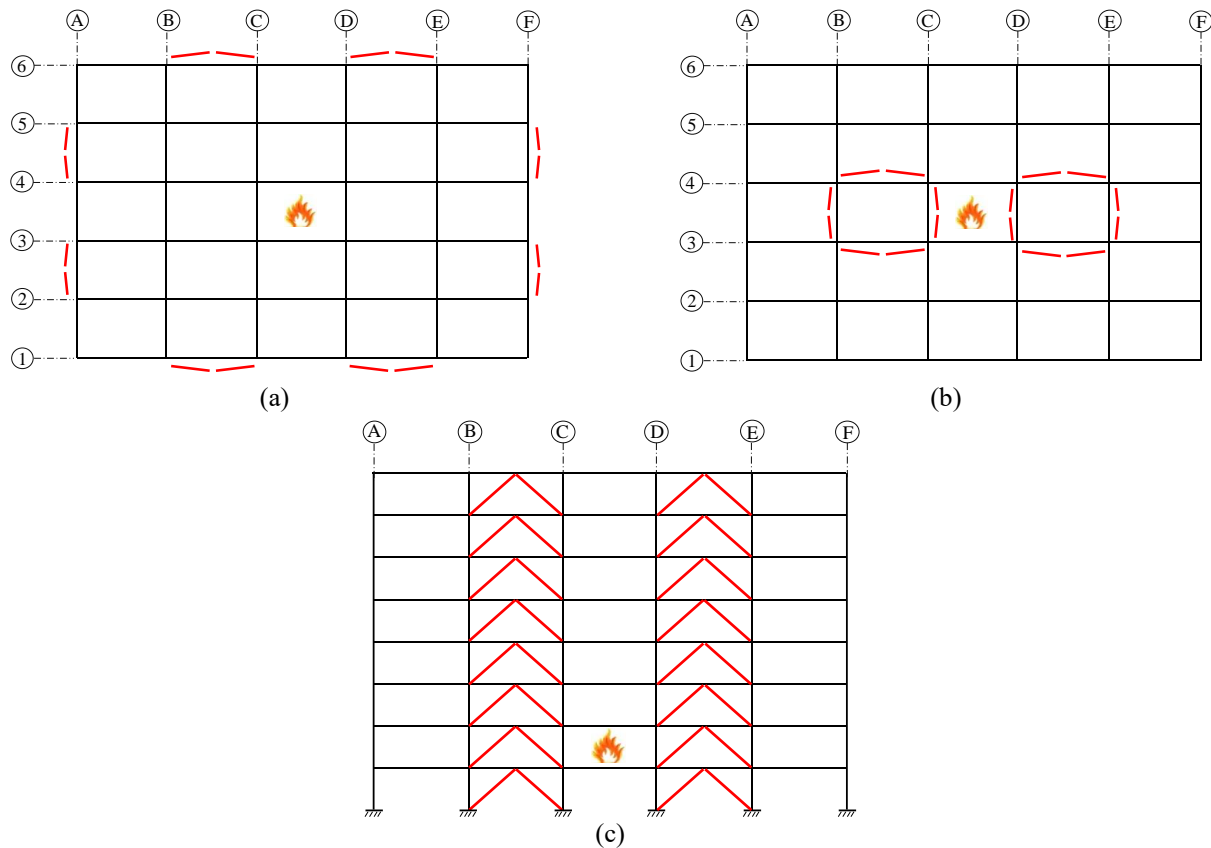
Layout of vertical bracing system: (a) plan view of Vertical-perimeter, (b) plan view of Vertical-internal and (c) elevation view
